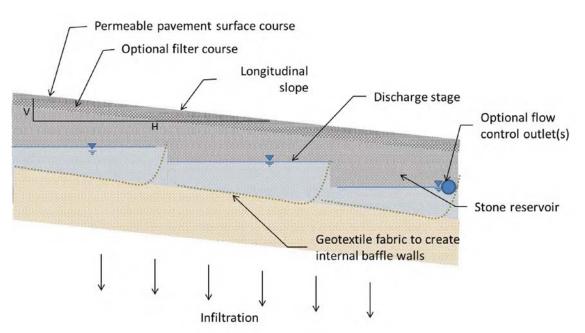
Longitudinal profile of an installation along a mild slope (geotextile cutoff walls).
